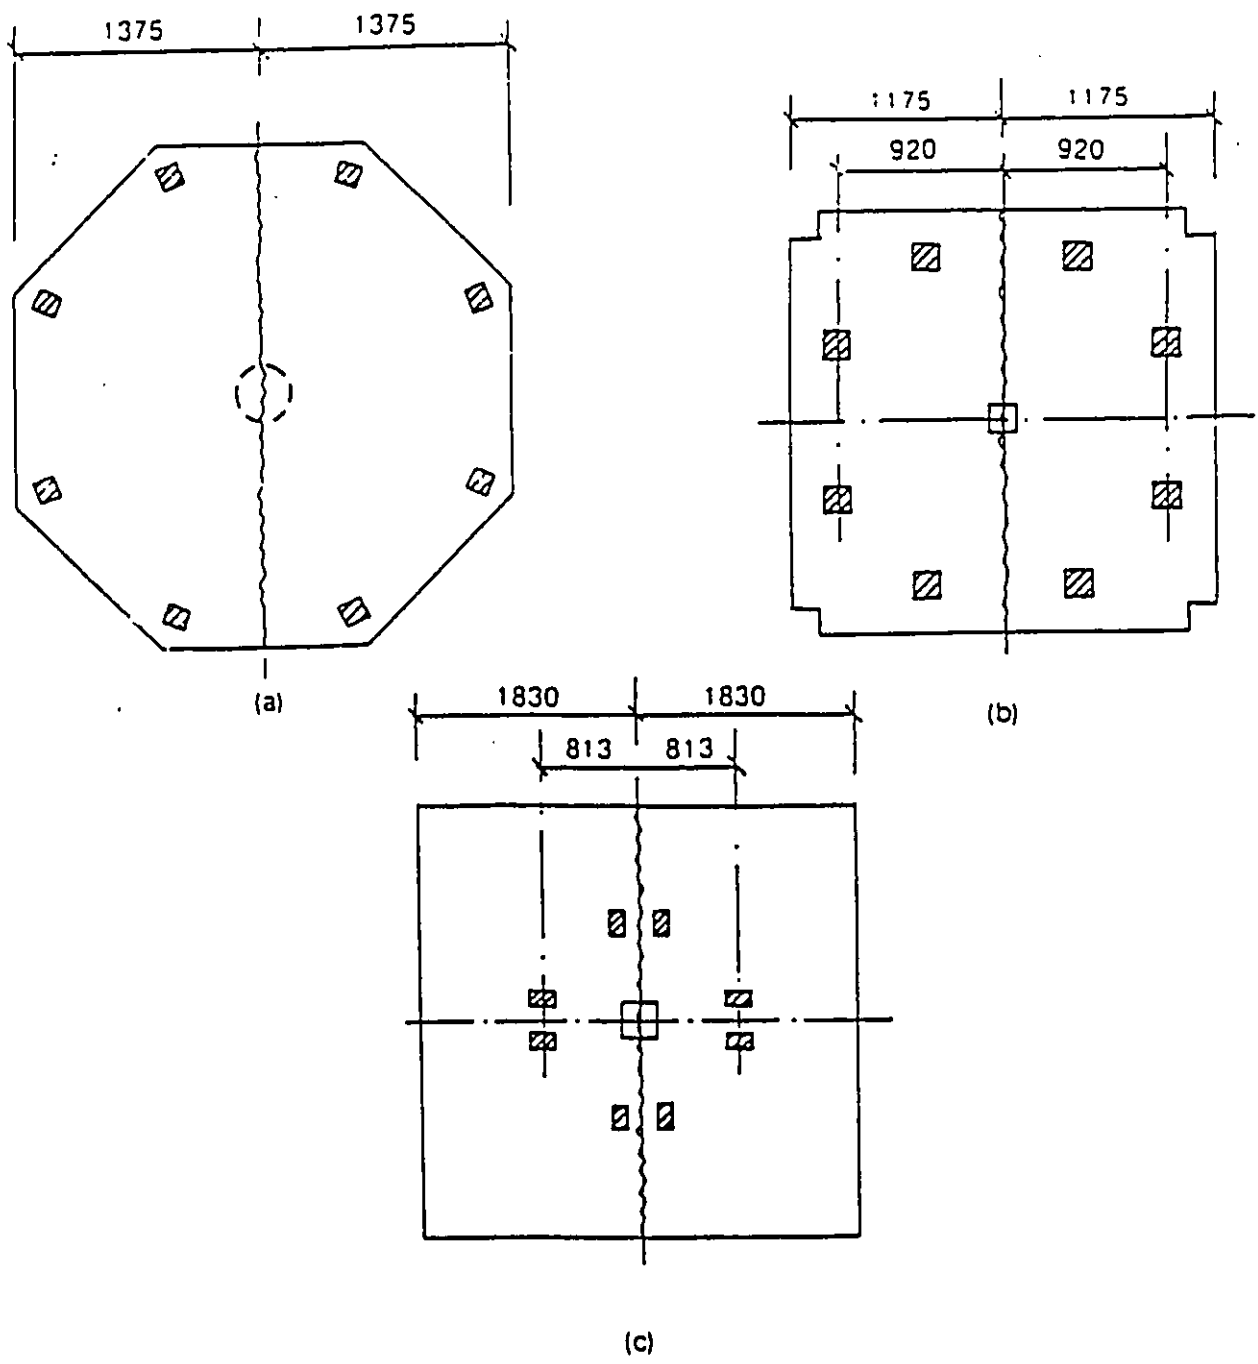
Load and support systems for two-way prestressed slabs (Regan 1985)
